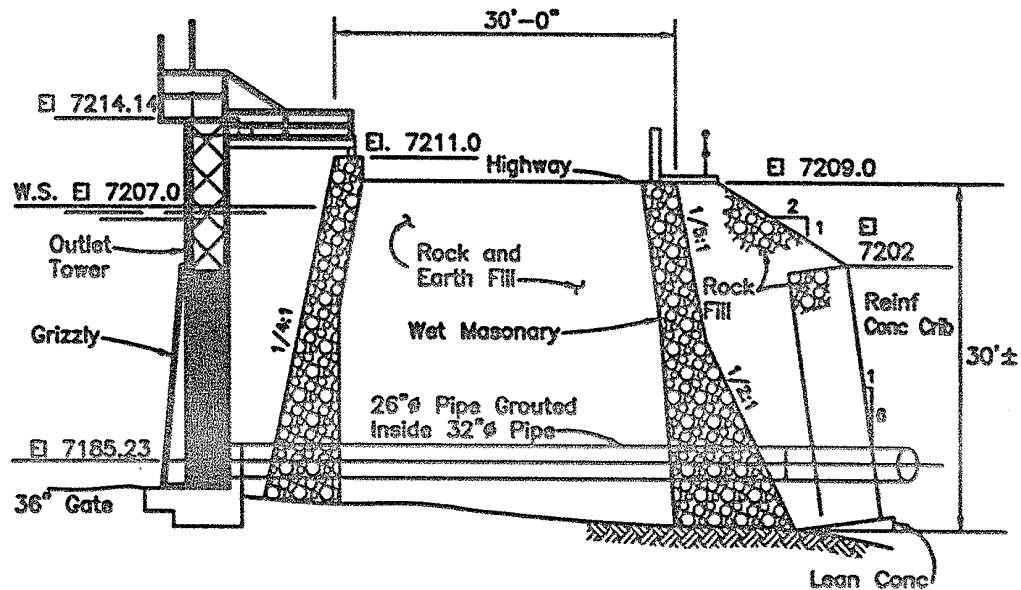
Silver Lake Dam cross-section showing outlet tower and gate location.
